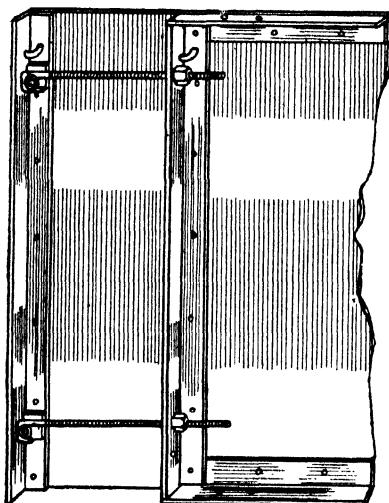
ADJUSTABLE " METAFORM " UNIT FOR CONCRETE CONSTRUCTION
